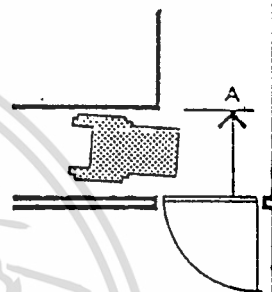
FIG. AREAS SET FOR DISABLE IN PLACES OF ASSEMBLY
